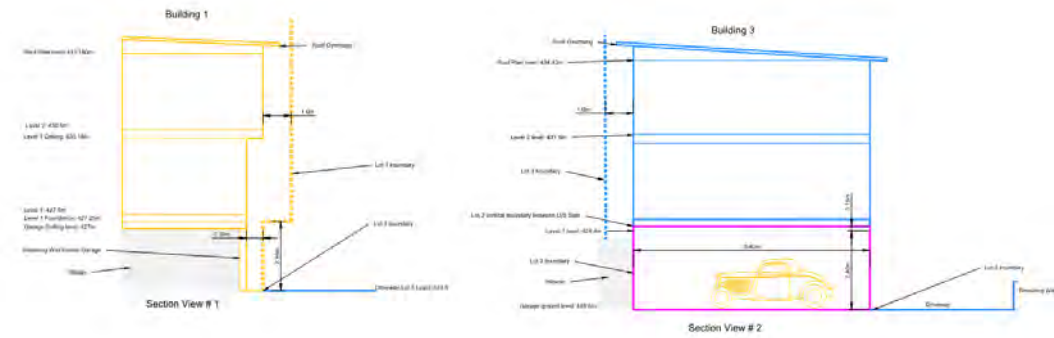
; Proposed subdivision Plan showing Lot 1 (Yellow outline), Lot 2 (Pink Outline) and Lot 3 (Blue Outline)
